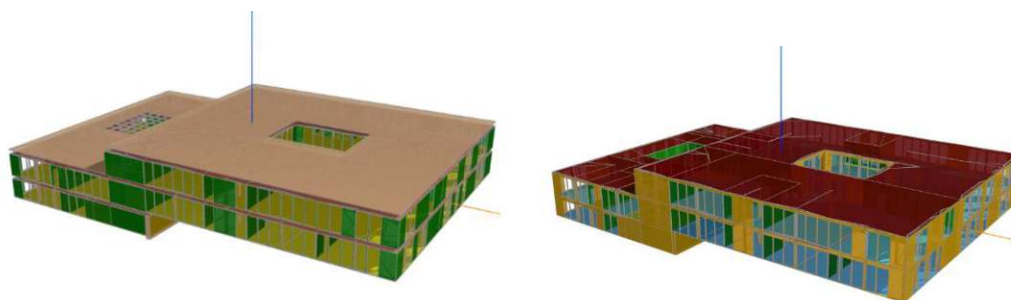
False recognition of the exterior walls, roof, and false ceiling in gbXML schema (left) and corrected version (right)
